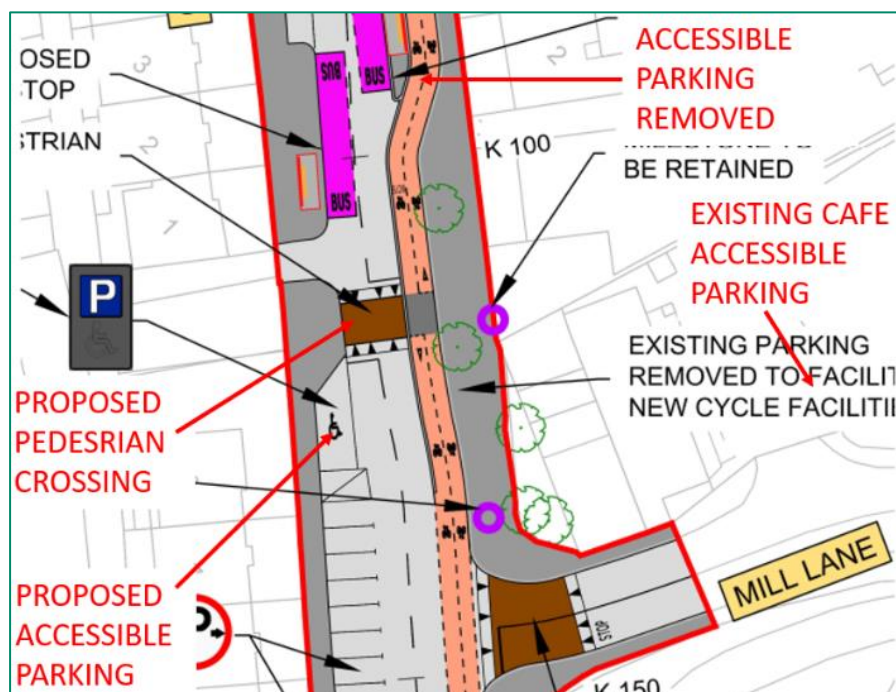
Extract of General Arrangement Drawings showing the proposed accessible parking at no. 8 Red Cow Cottages
